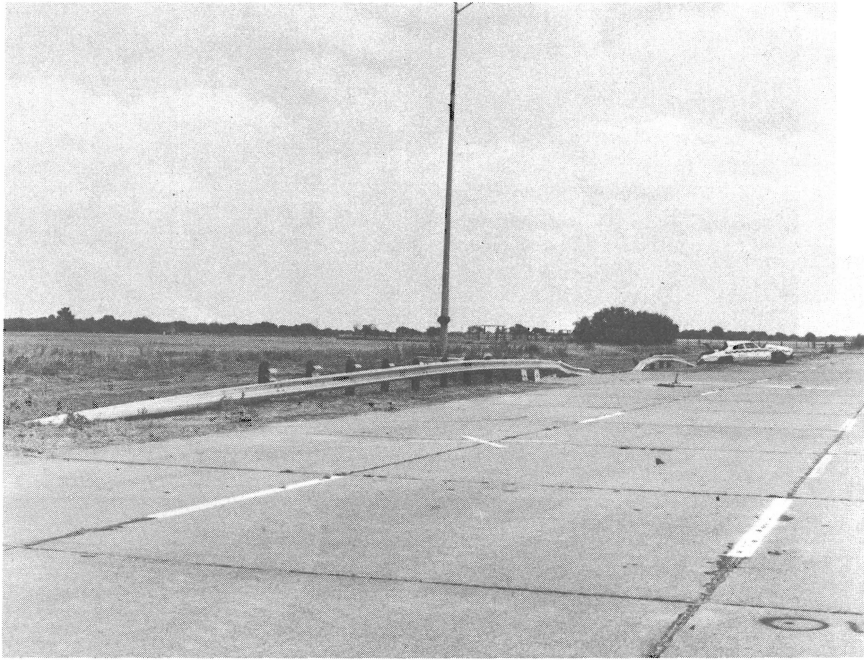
Unsuccessful Bridge Rail after Test 1A.
